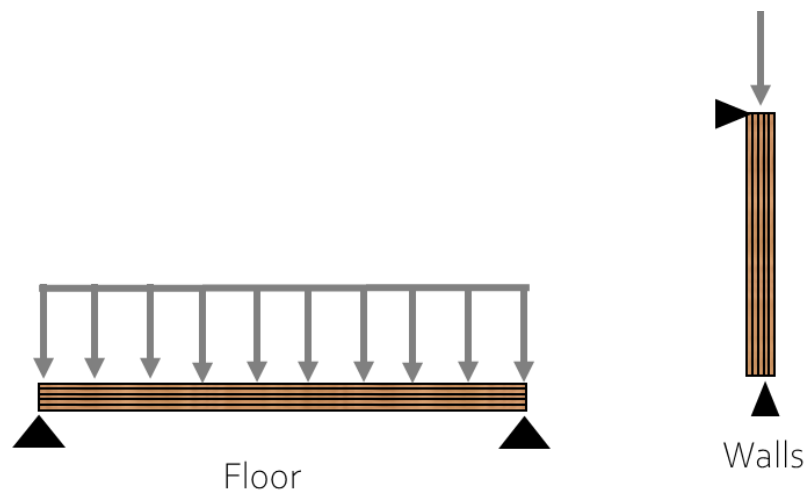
Structural scheme, consisting of characteristics wall and floor elements
